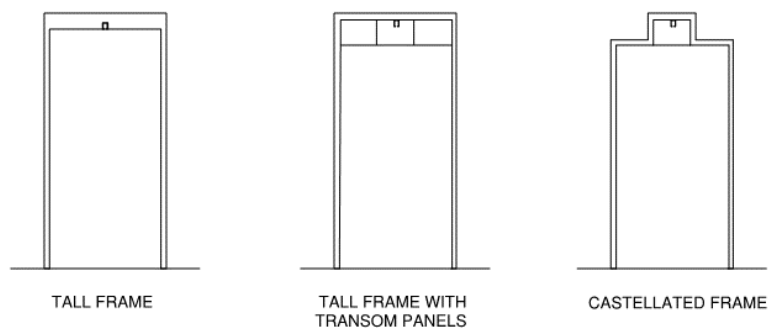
The above frame elevations are typical for how they would be represented in construction documents.
